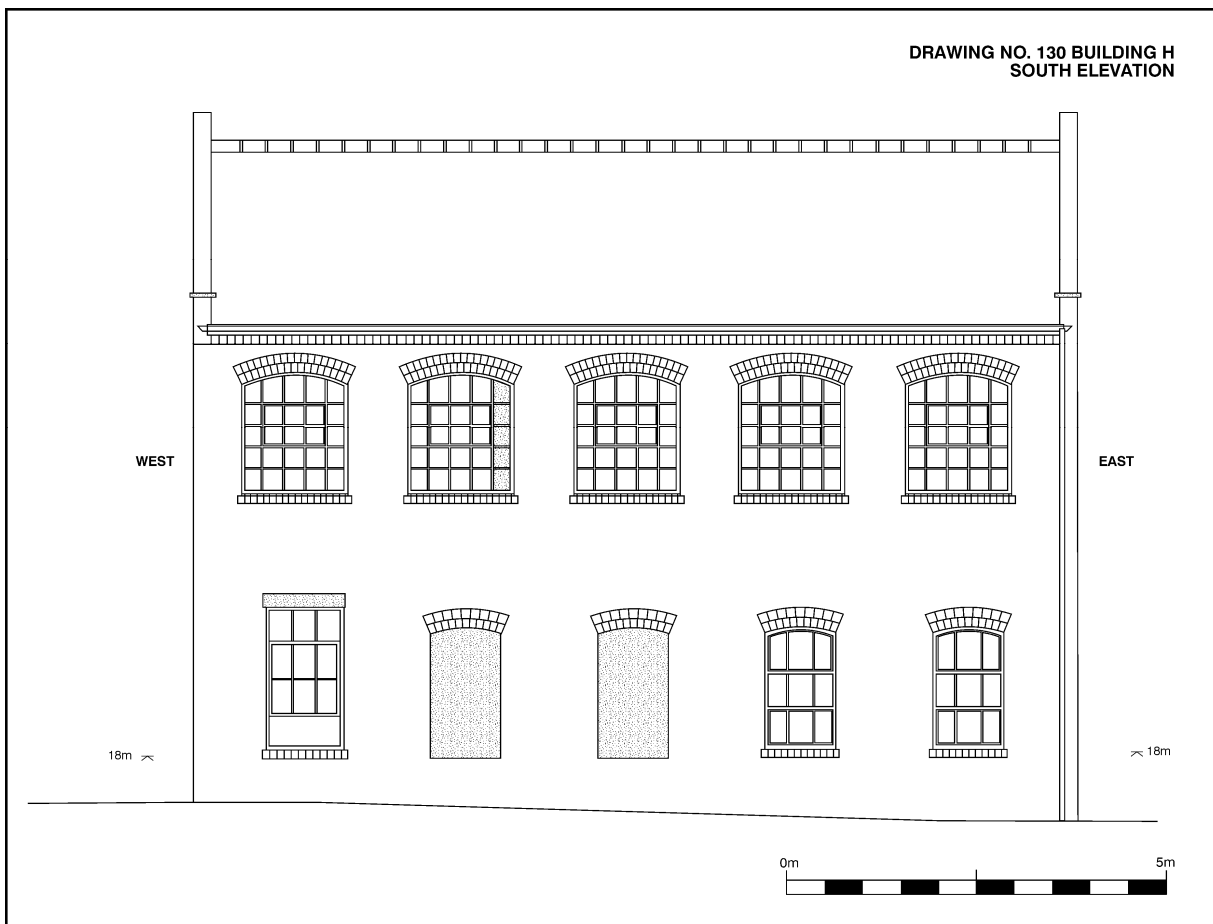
Survey drawing of the south elevation of Building H (scale 1:100)
